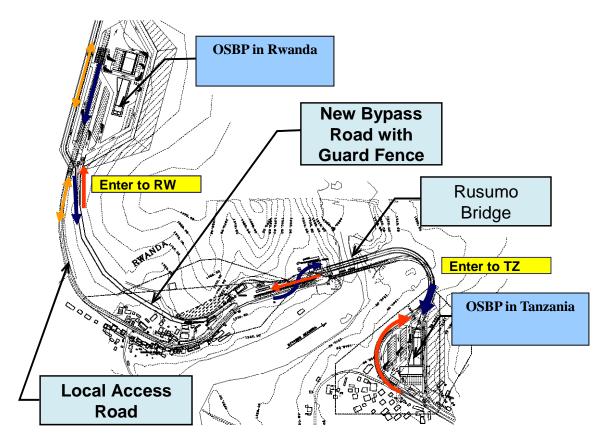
Images of New Rusumo Bridge, OSBP Facilities and Bypass Road
